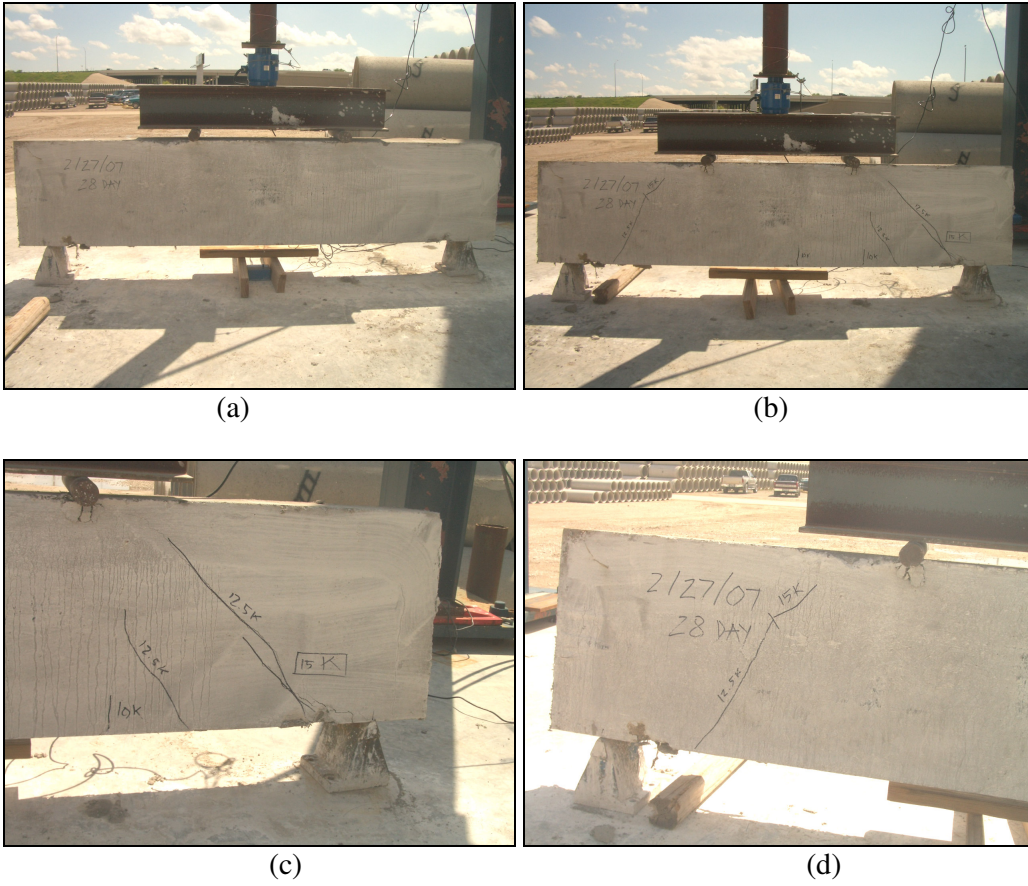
Ductile lightweight concrete beam with reinforcement cast on 2/27/07 for 28 day test; (a) before test, (b), (c), and (d) cracks on the beam after test
